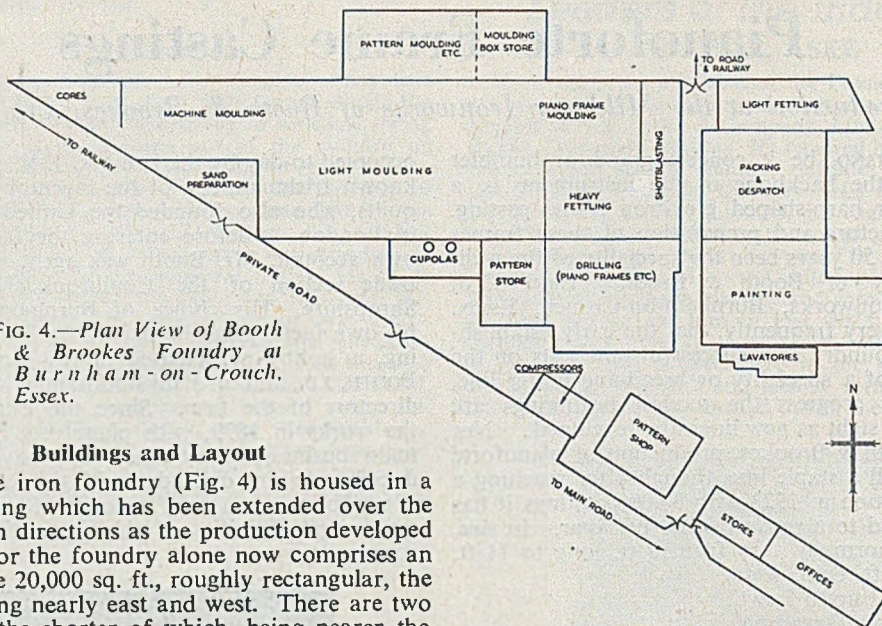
Plan View of Booth & Brookes Foundry at Burnham-on-Crouch, Essex.
